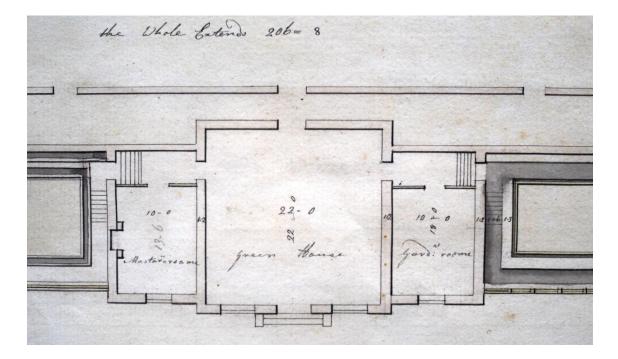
DETAIL FROM 1758 STOVE PLAN SHOWING THE CENTRAL GREENHOUSE WITH 'MASTER'S ROOM' (WITH A FIREPLACE) AND 'GARDENER'S ROOM' (BURTON CONSTABLE HALL, 1758)
